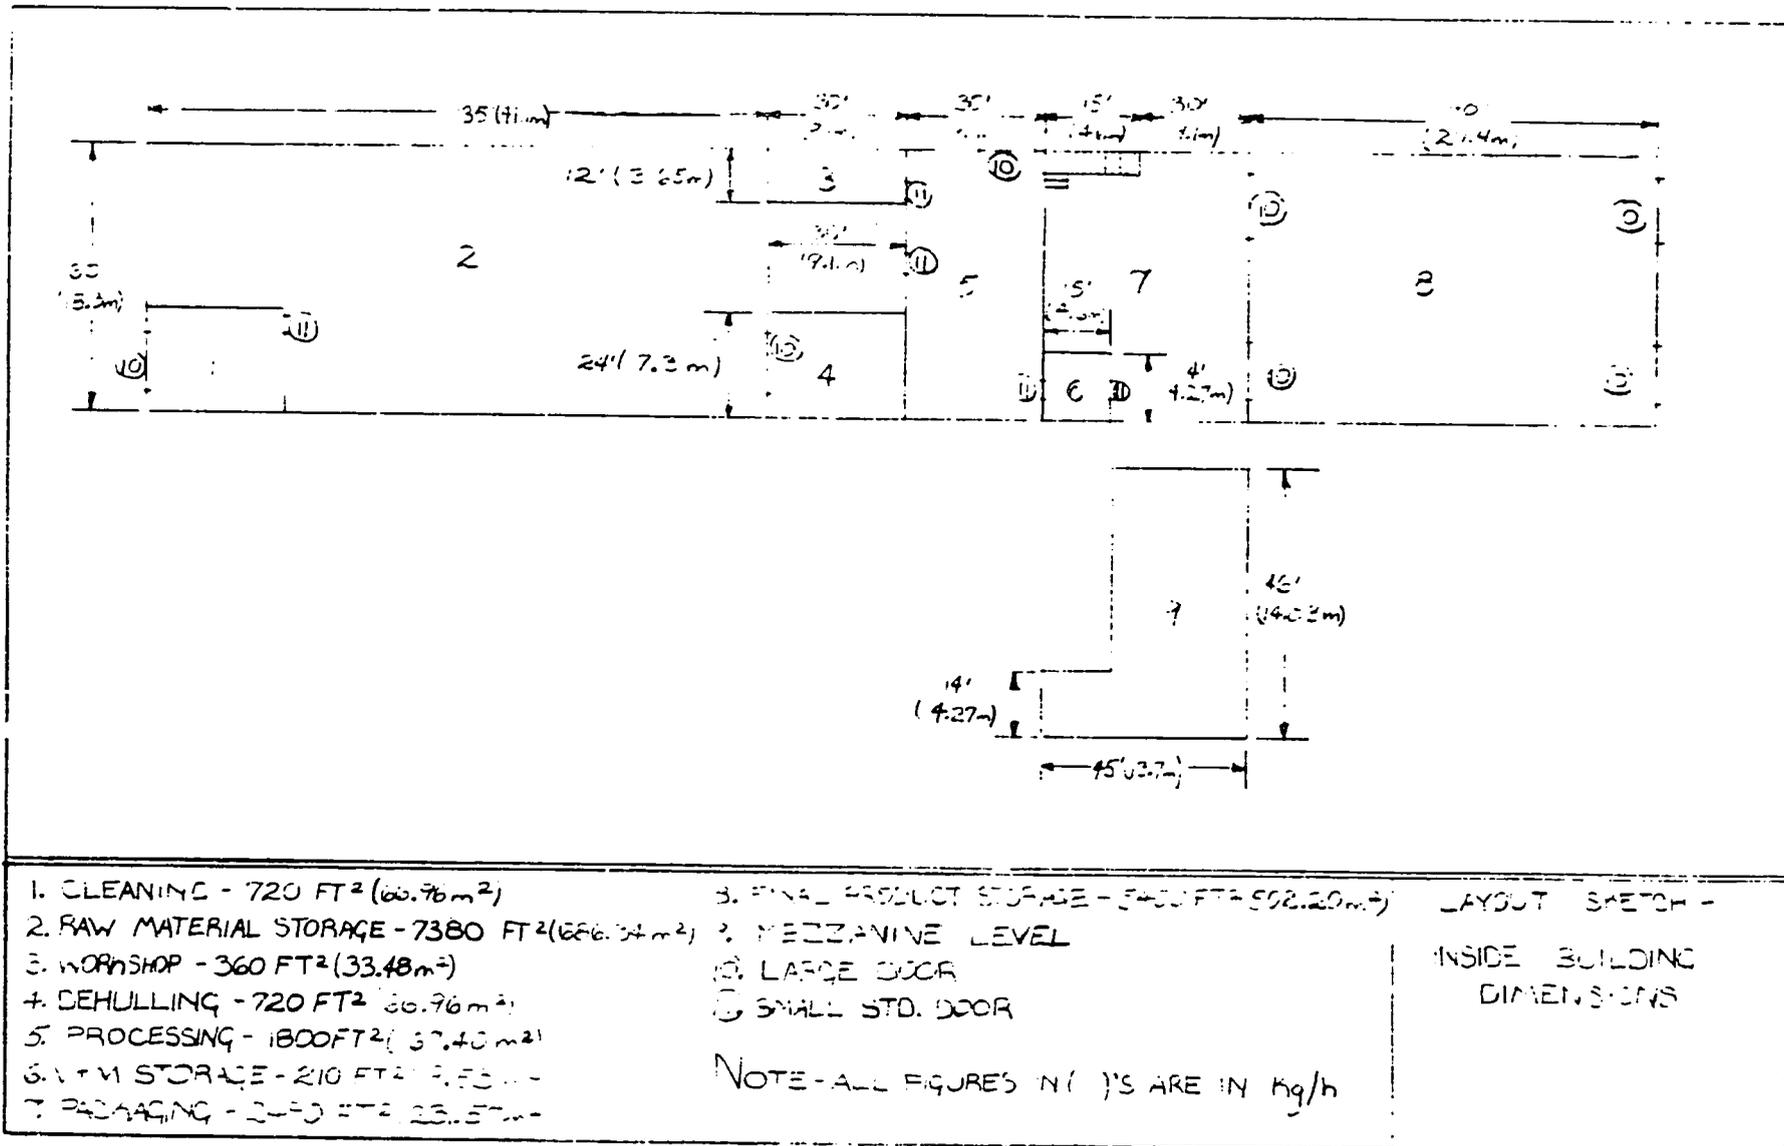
Layout sketch, inside building dimensions.
